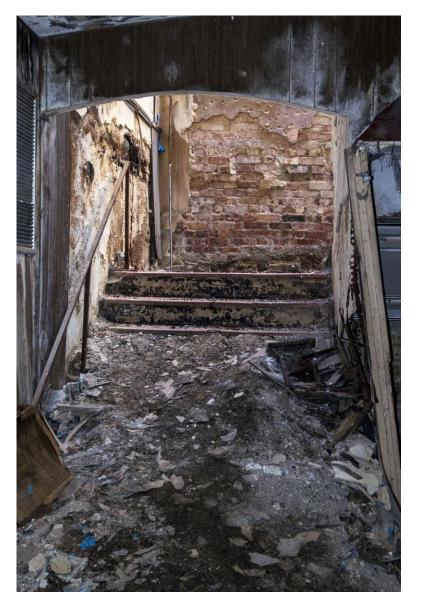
Seating in segregated section of mezzanine, Camera facing north
